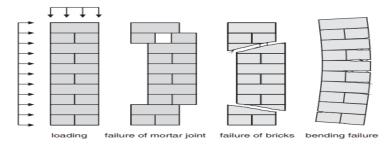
URM failure modes under out-of-plane loading (Lönhoff and Sadegh-Azar, 2018).
